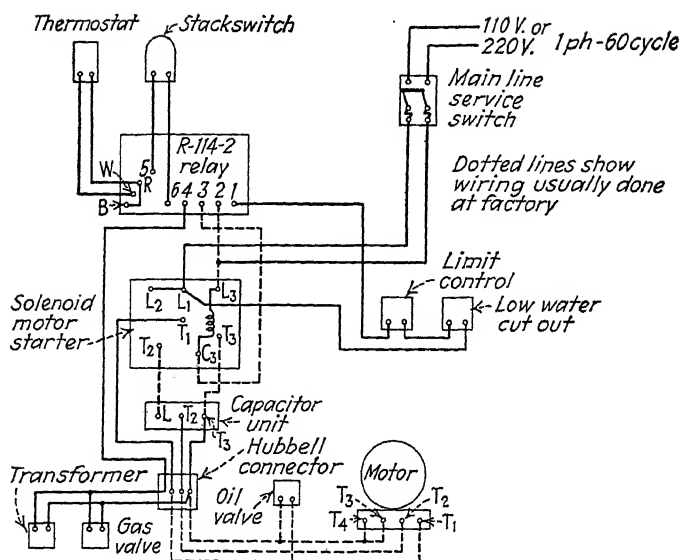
Wiring diagram for single-phase motor on commercial or industrial oil burner: capacitor motor, Minneapolis-Honeywell R-114-2 relay, solenoid motor starter, and electric-gas ignition.
